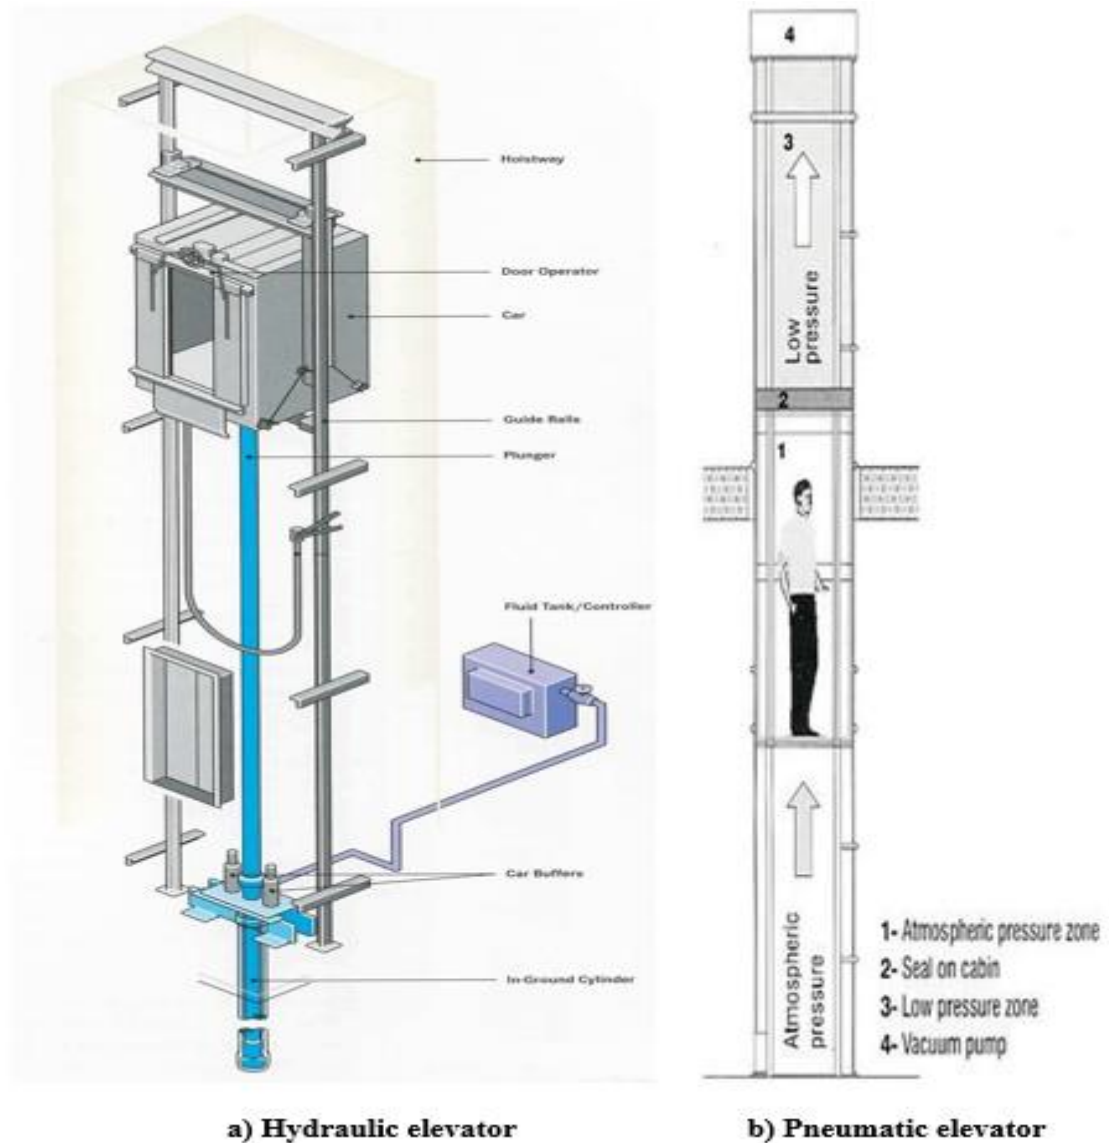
a) Hydraulic elevator b) pneumatic elevator.
